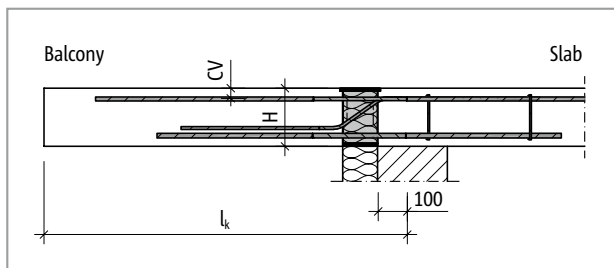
Schöck Isokorb® XT type K-M12 to M13: Static system
